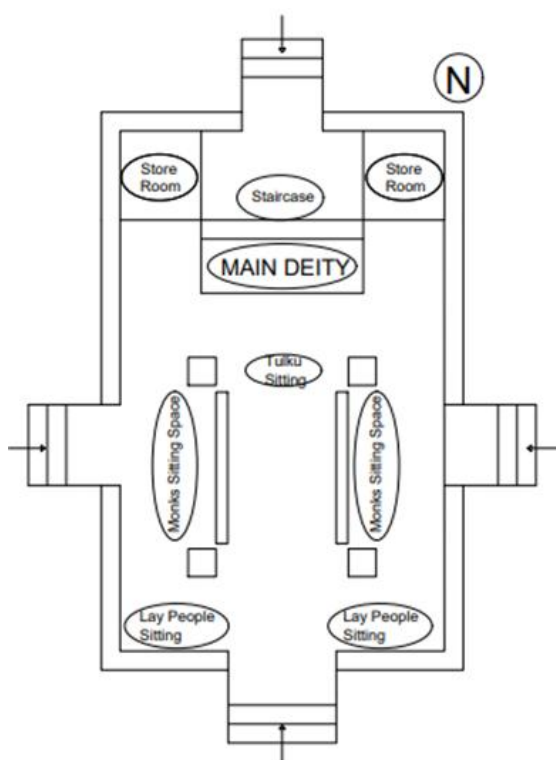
Floor plan of the main prayer hall of a Monastery.
